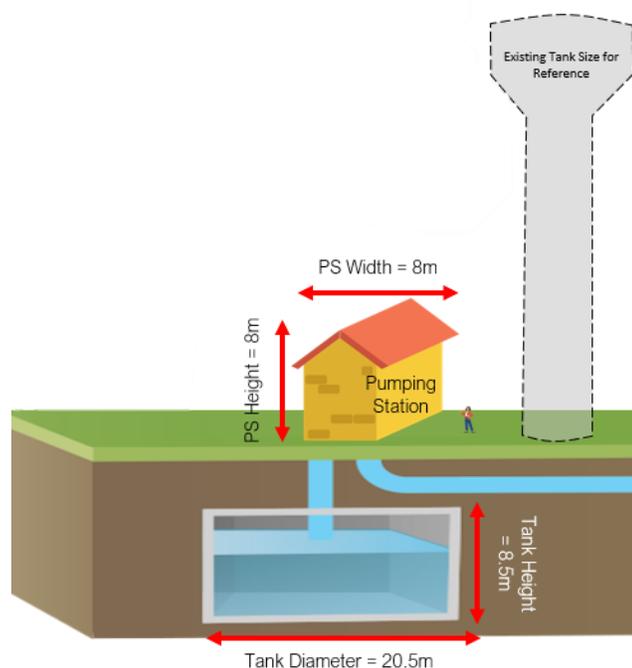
Alternative 6: In-Ground Reservoir to Replace Existing Elevated Tank
